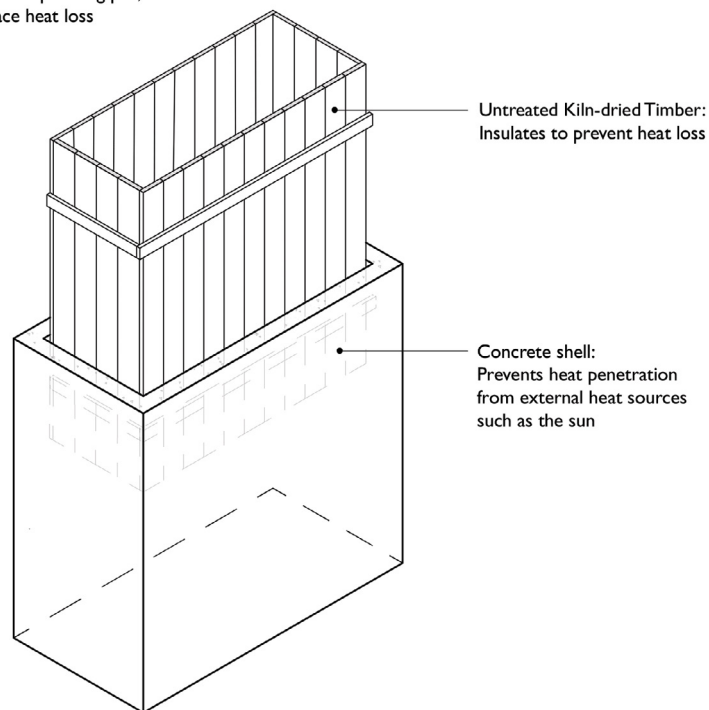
Proposed constructed composting chamber's materiality and shape (Author 2015).
